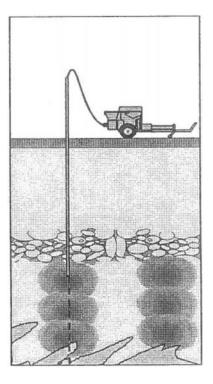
Compaction grout bulb construction (Schaefer et al. 1997)
